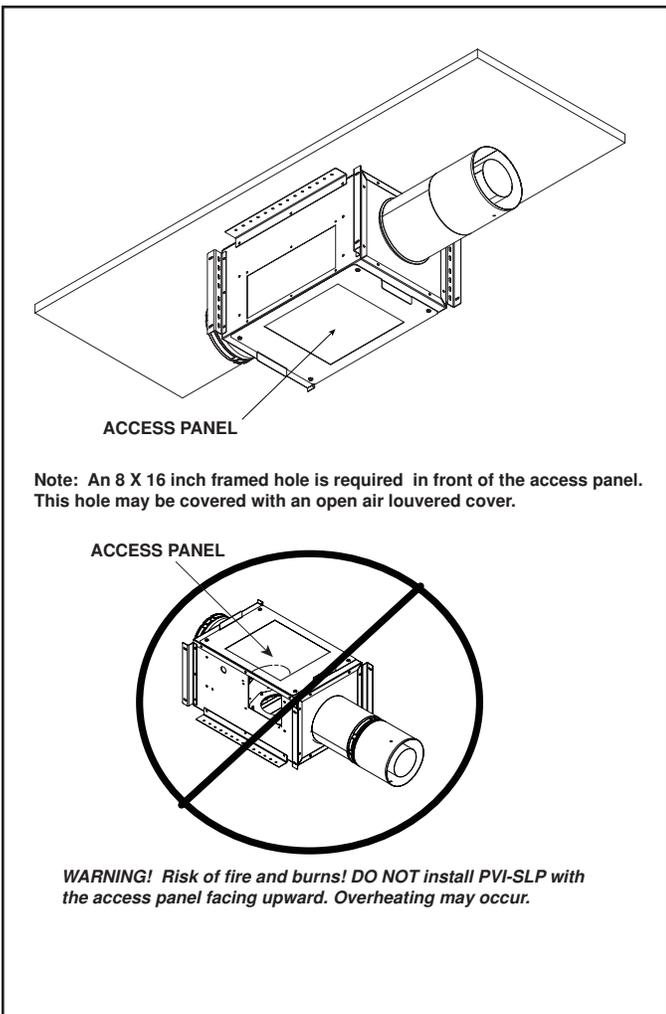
PVI-SLP Mounted to Horizontal Surface
